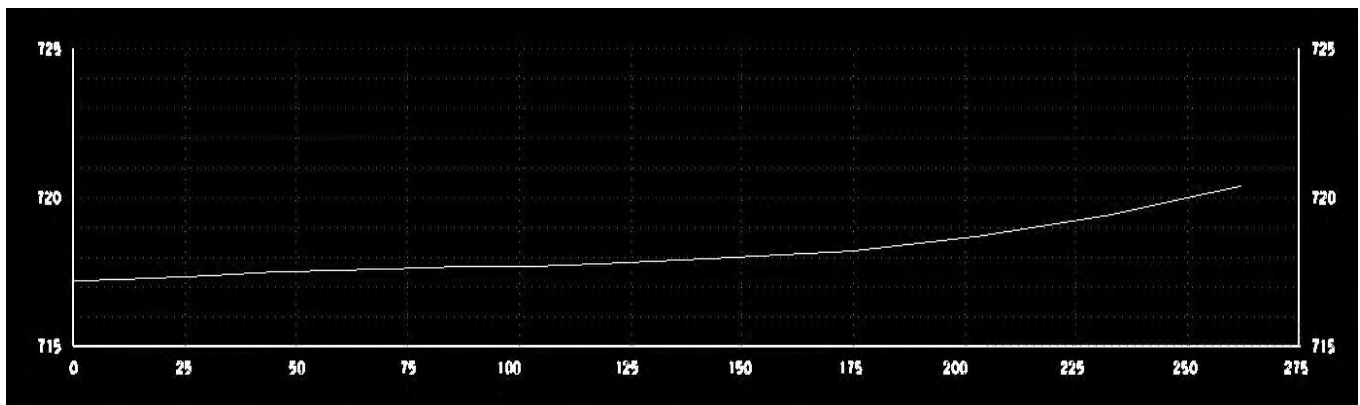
Profile of Spot Elevations in Ramp D – Note: LowPoint is Beyond (Northwest of) Station Zero
